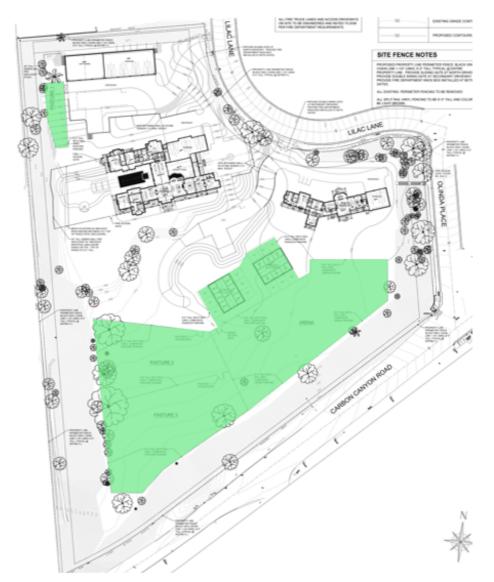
Proposed On-site Equestrian Facilities (Green Areas)
